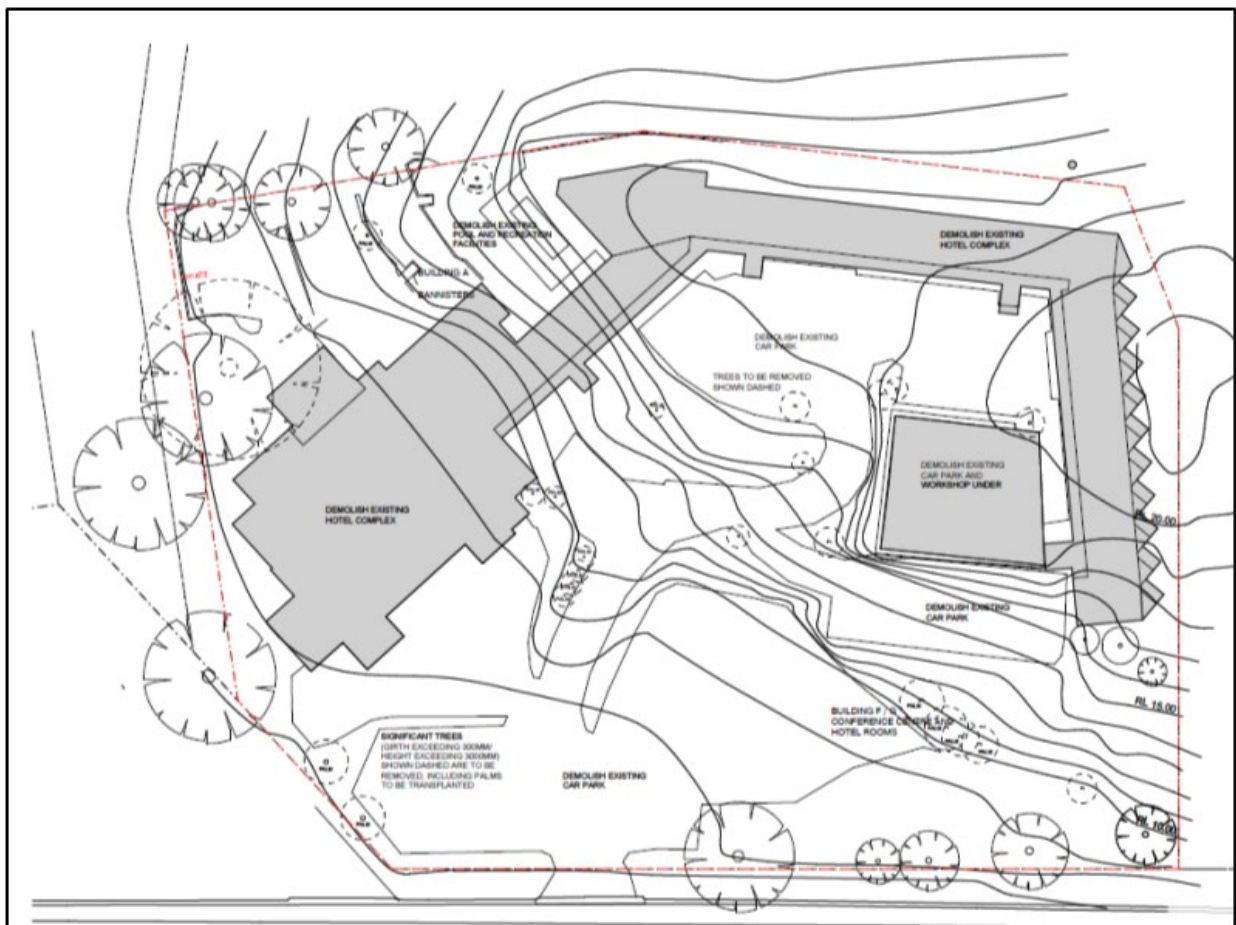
Provided landscape plans displaying the development site boundary (red line) and the existing resort layout (including; buildings, facilities and landscaping). Note: plans provided by the proponent and locations approximate only.
